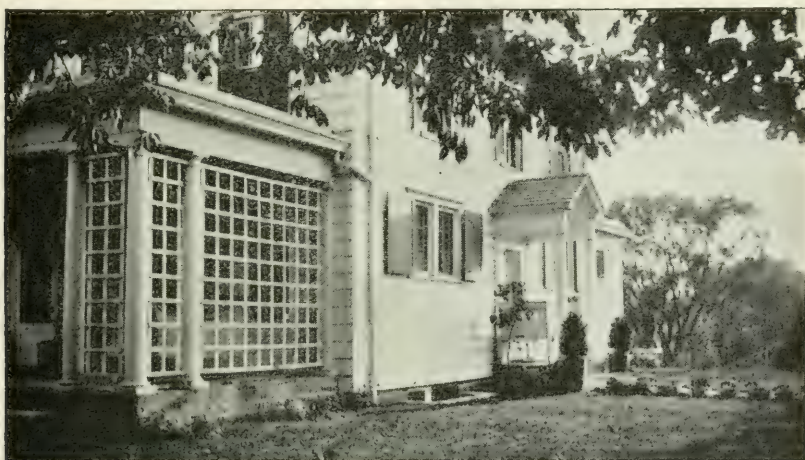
Perspective view of a white shingle country house. The foreground shows a room-shaped porch, twelve by twenty feet, with ends covered by decorative lattice to be used for vines. Floor level two steps above grade. Porch floors with brick edge and cement body. Areas built around cellar windows
